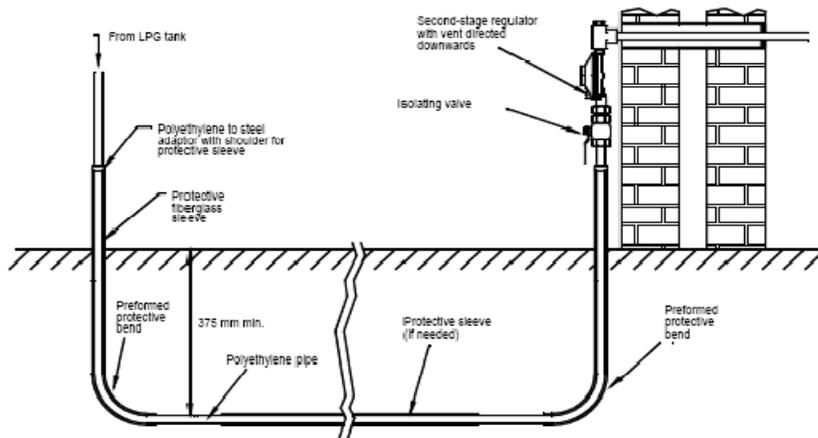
Example of External Buried Pipework for LPG (source: *I.S.813:2002, Annex G*)
